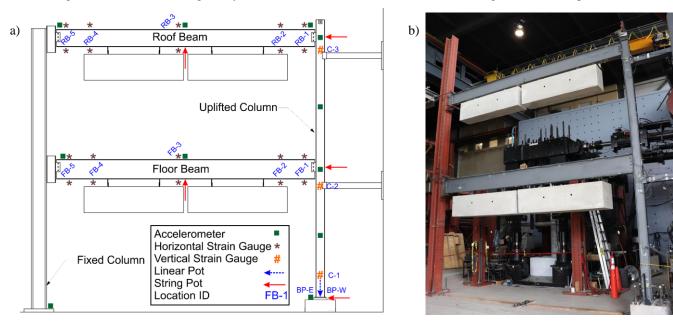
Test setup: a) Instrumentation of the specimen; b) Overall view of the test setup.
